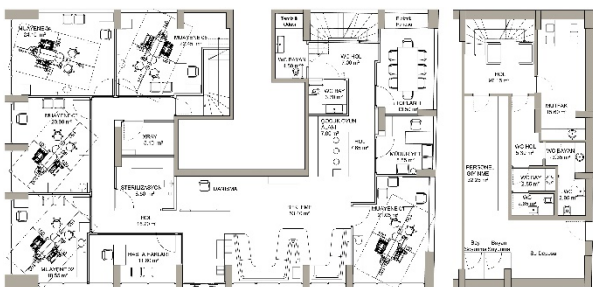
Ground and Basement Floor (Adapted from ND Architecture Drawings).
